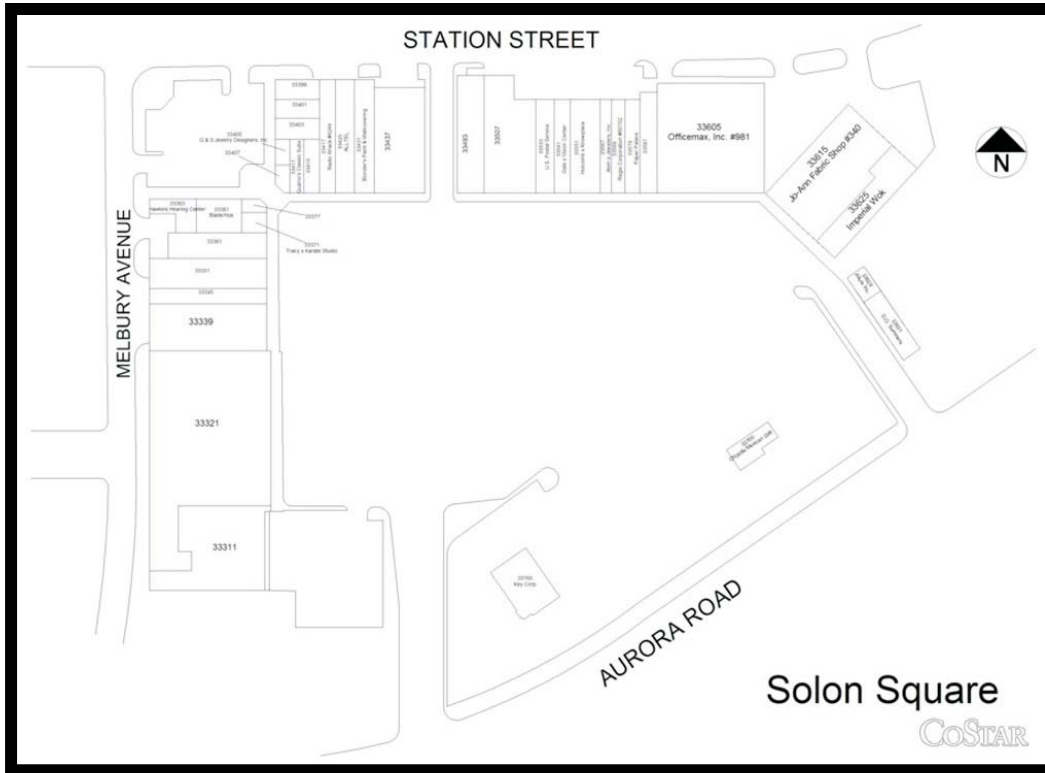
Site plan for ca. 1958 strip shopping center at 33311-33631 Aurora Road, Solon (Showcase.com 2010c).
